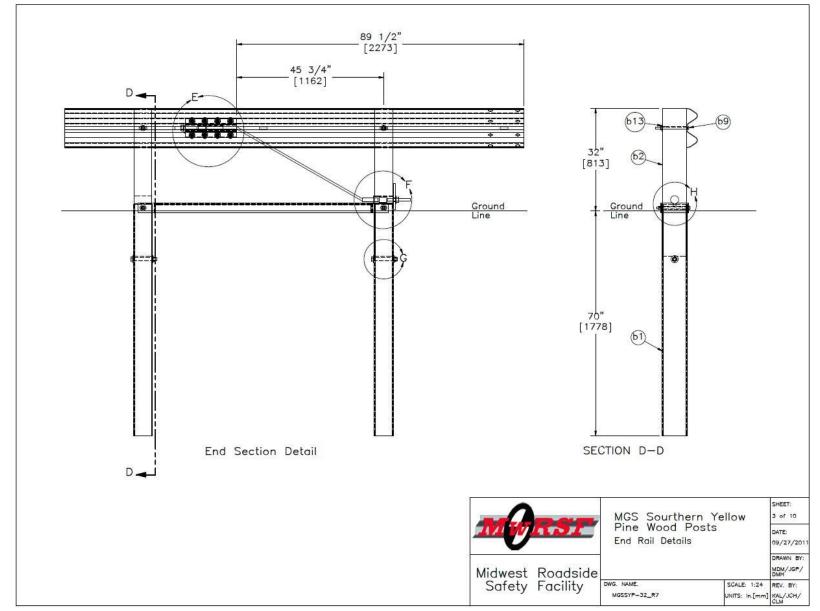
Anchorage Layout, Test No. MGSSYP-2
